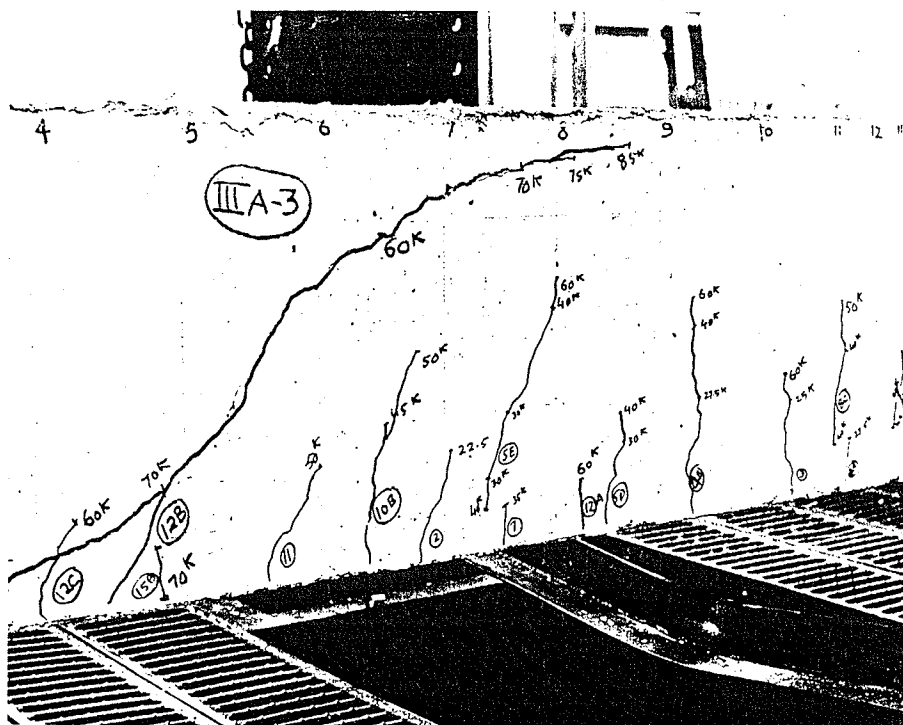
CRACKS ON END S-2 AT FAILURE OF BEAM IIIA-3
